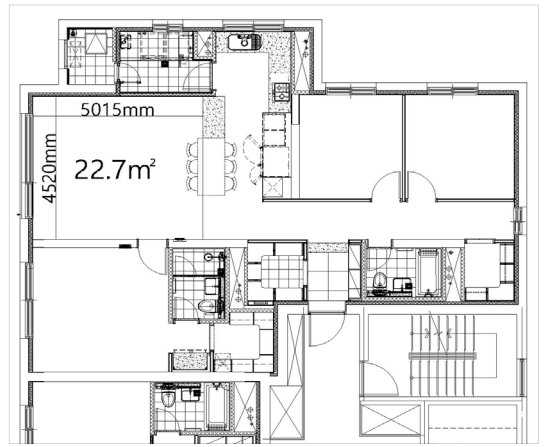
Floor plan of the unit C(84 m<sup>2</sup>, 2 bay)
